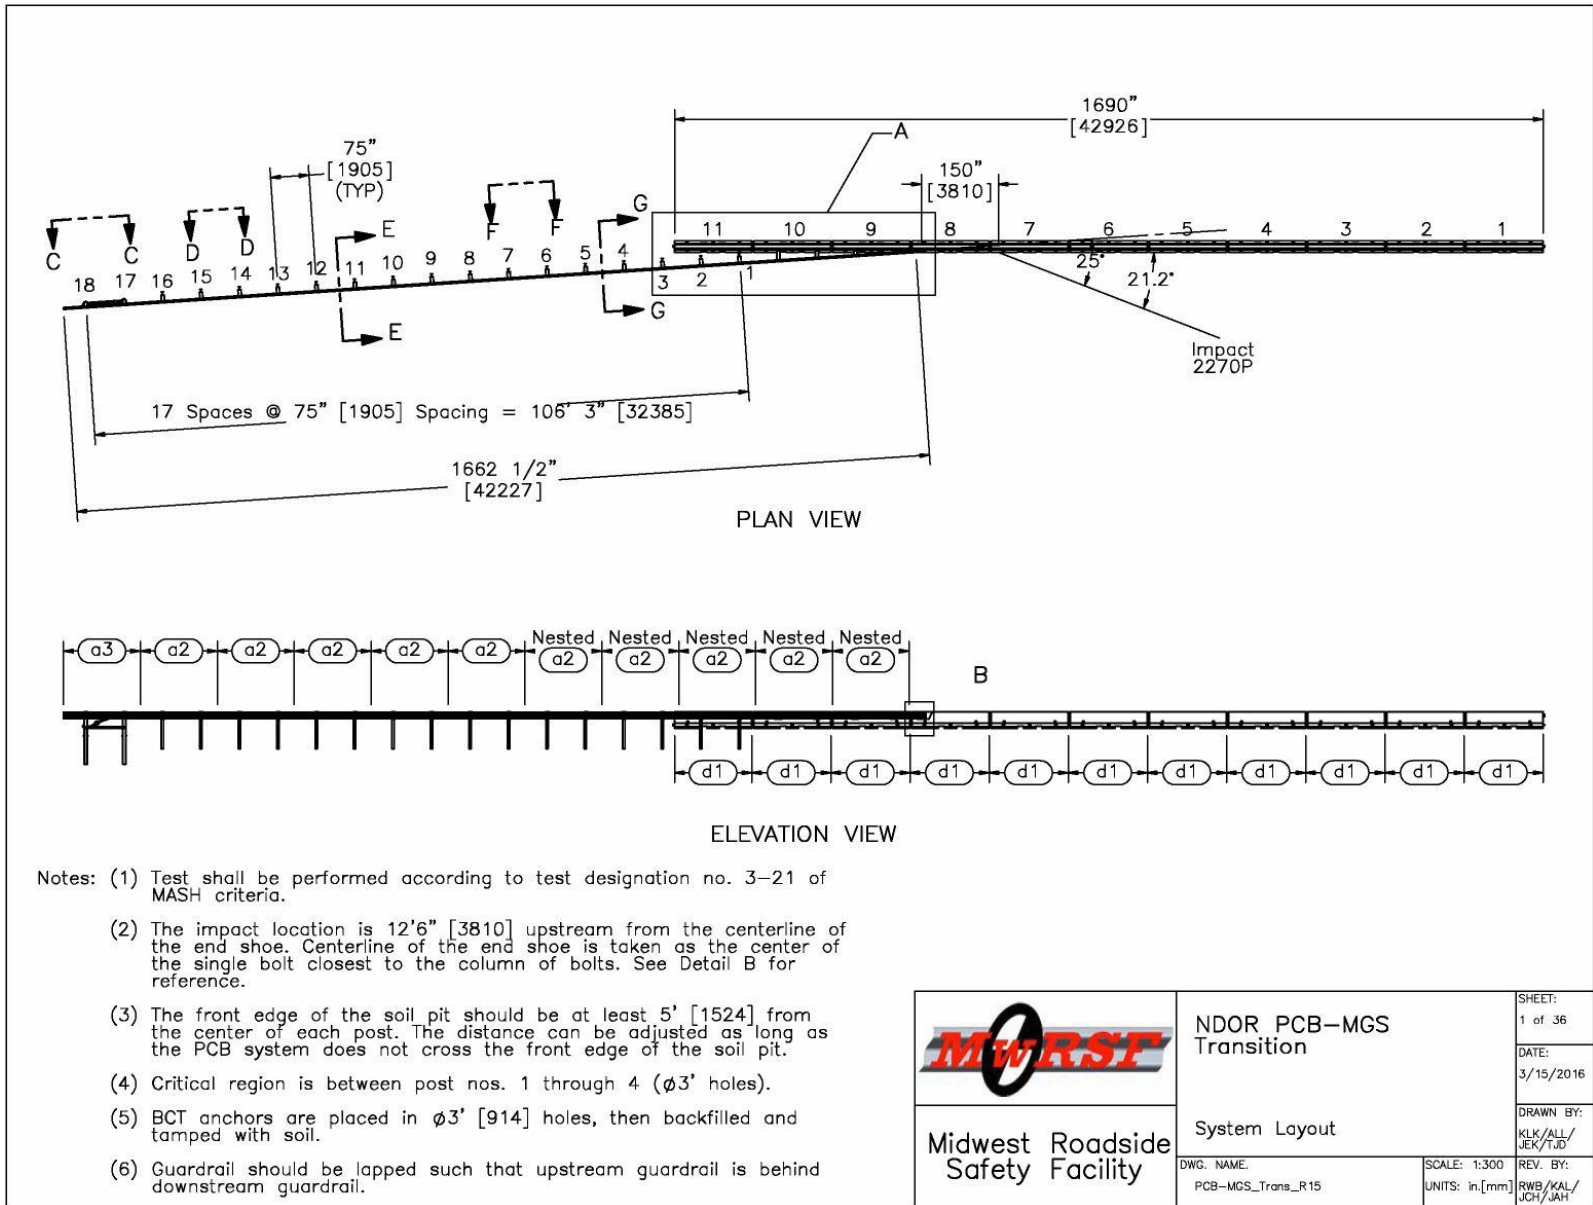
Test Installation Layout, Test No. MGSPCB-3
